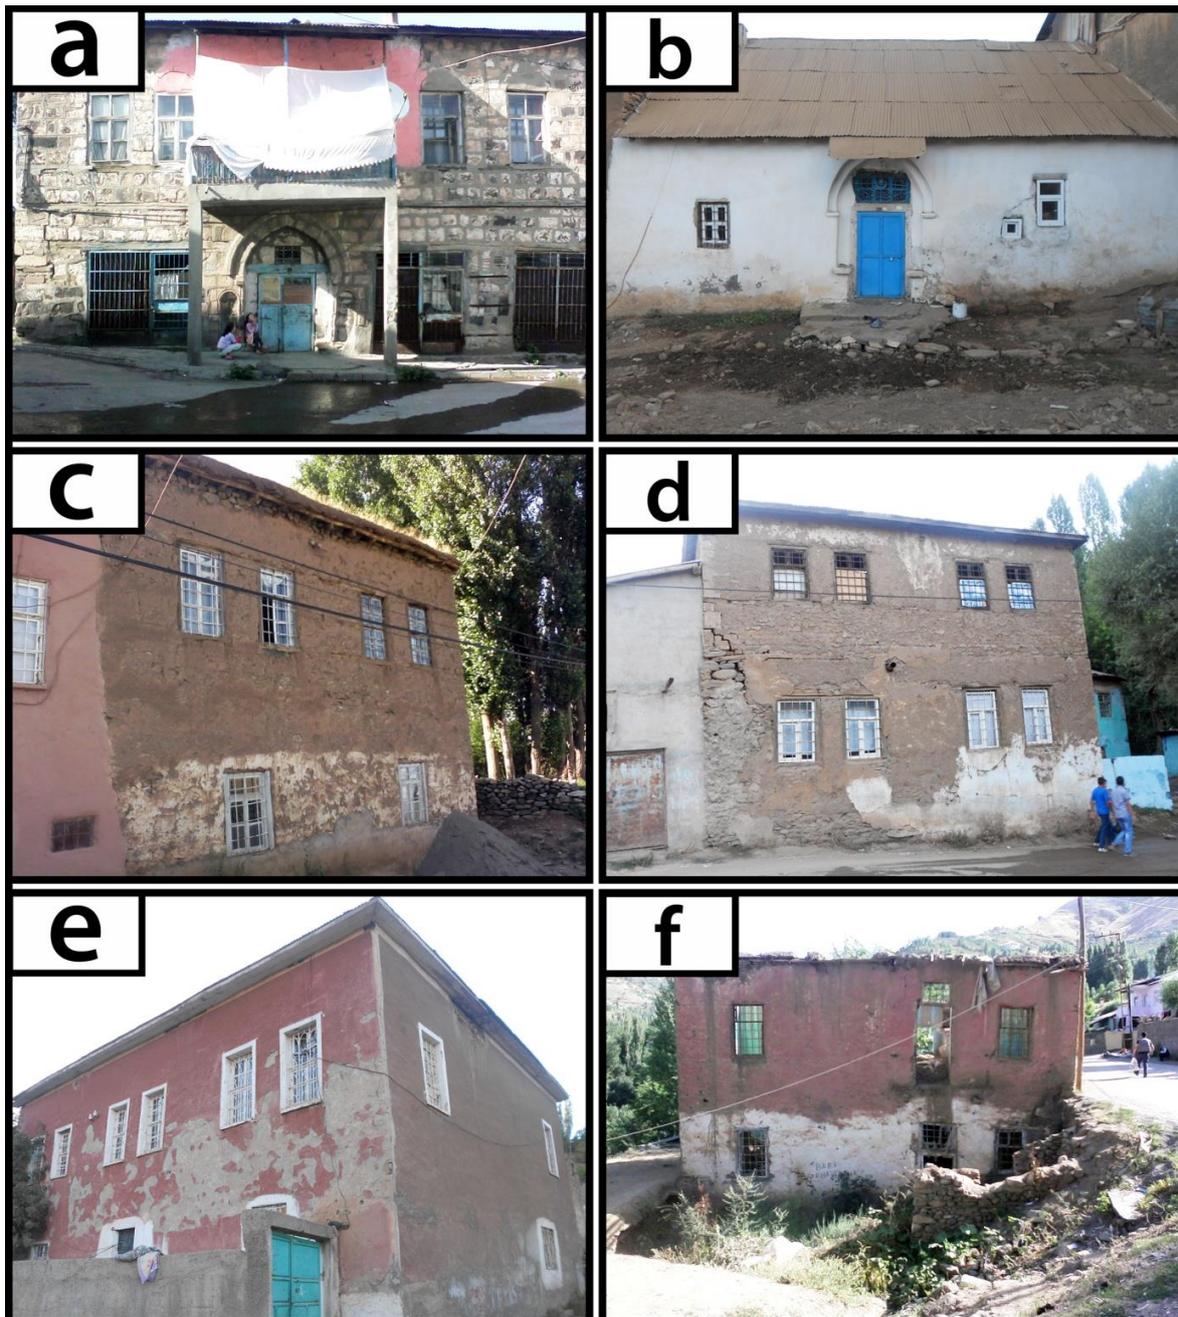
Facade forms of traditional Muş Houses; a, b) rectangular windows and arched entrances, c-f) rectangular windows observed on both floors reserved for residence.
